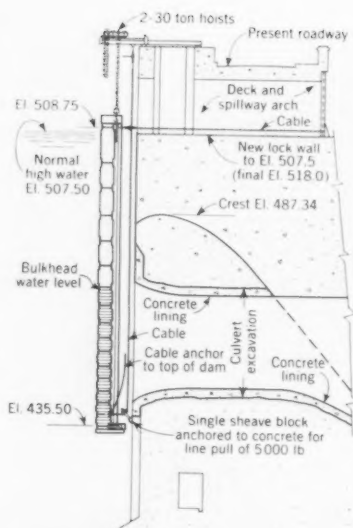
Floating bulkhead, 46 ft wide and 74 ft high, is positioned against face of dam and unwatered. Tunneling can then proceed through dam for lock-filling culverts. After floating to site, bulkhead was turned into vertical position by flooding of compartments in its base, seen at right in photo above. In photo at left, below, bulkhead is in position. Lines on it indicate finished culvert dimensions.
